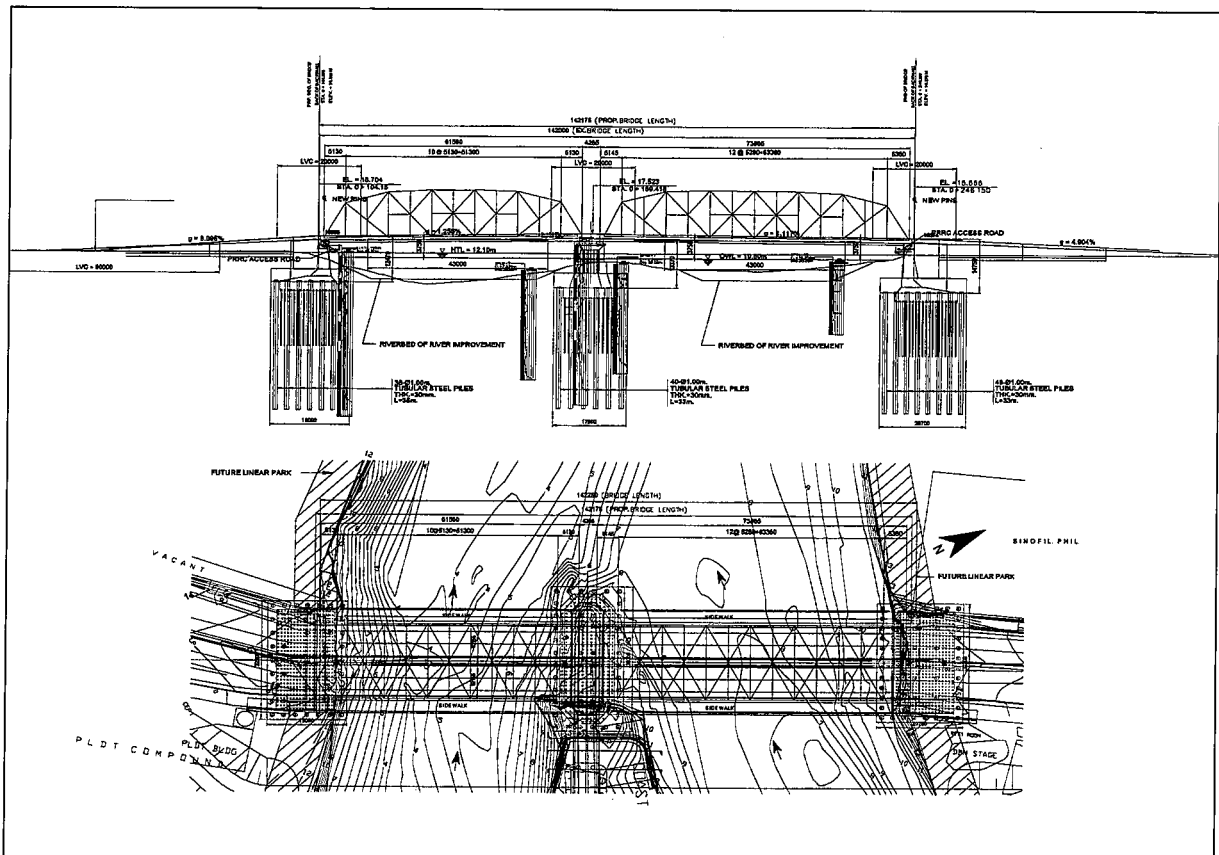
General View after Strengthening Works of Ayala Bridge
